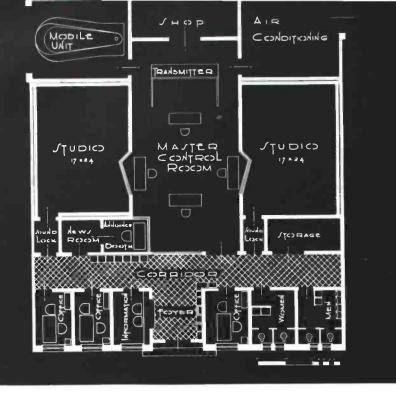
Floor plan of building designed to house studios, transmitier, offices and other facilities of a small television station.
